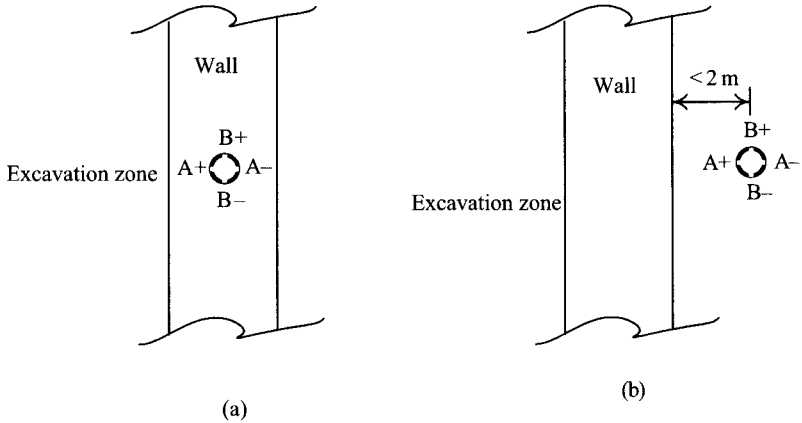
Installation of inclinometer casings with diaphragm walls: (a) installed in the diaphragm wall and (b) installed outside of the diaphragm wall.
